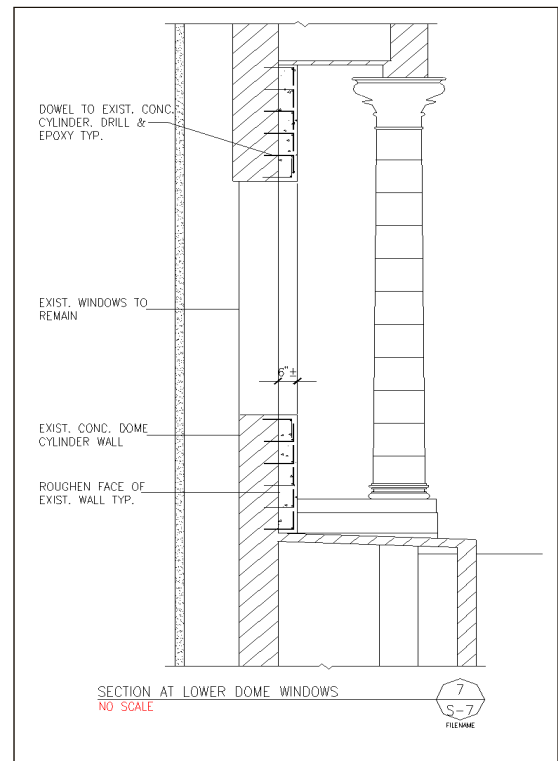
Schematic Detail for Reinforcing Lower Dome Windows
